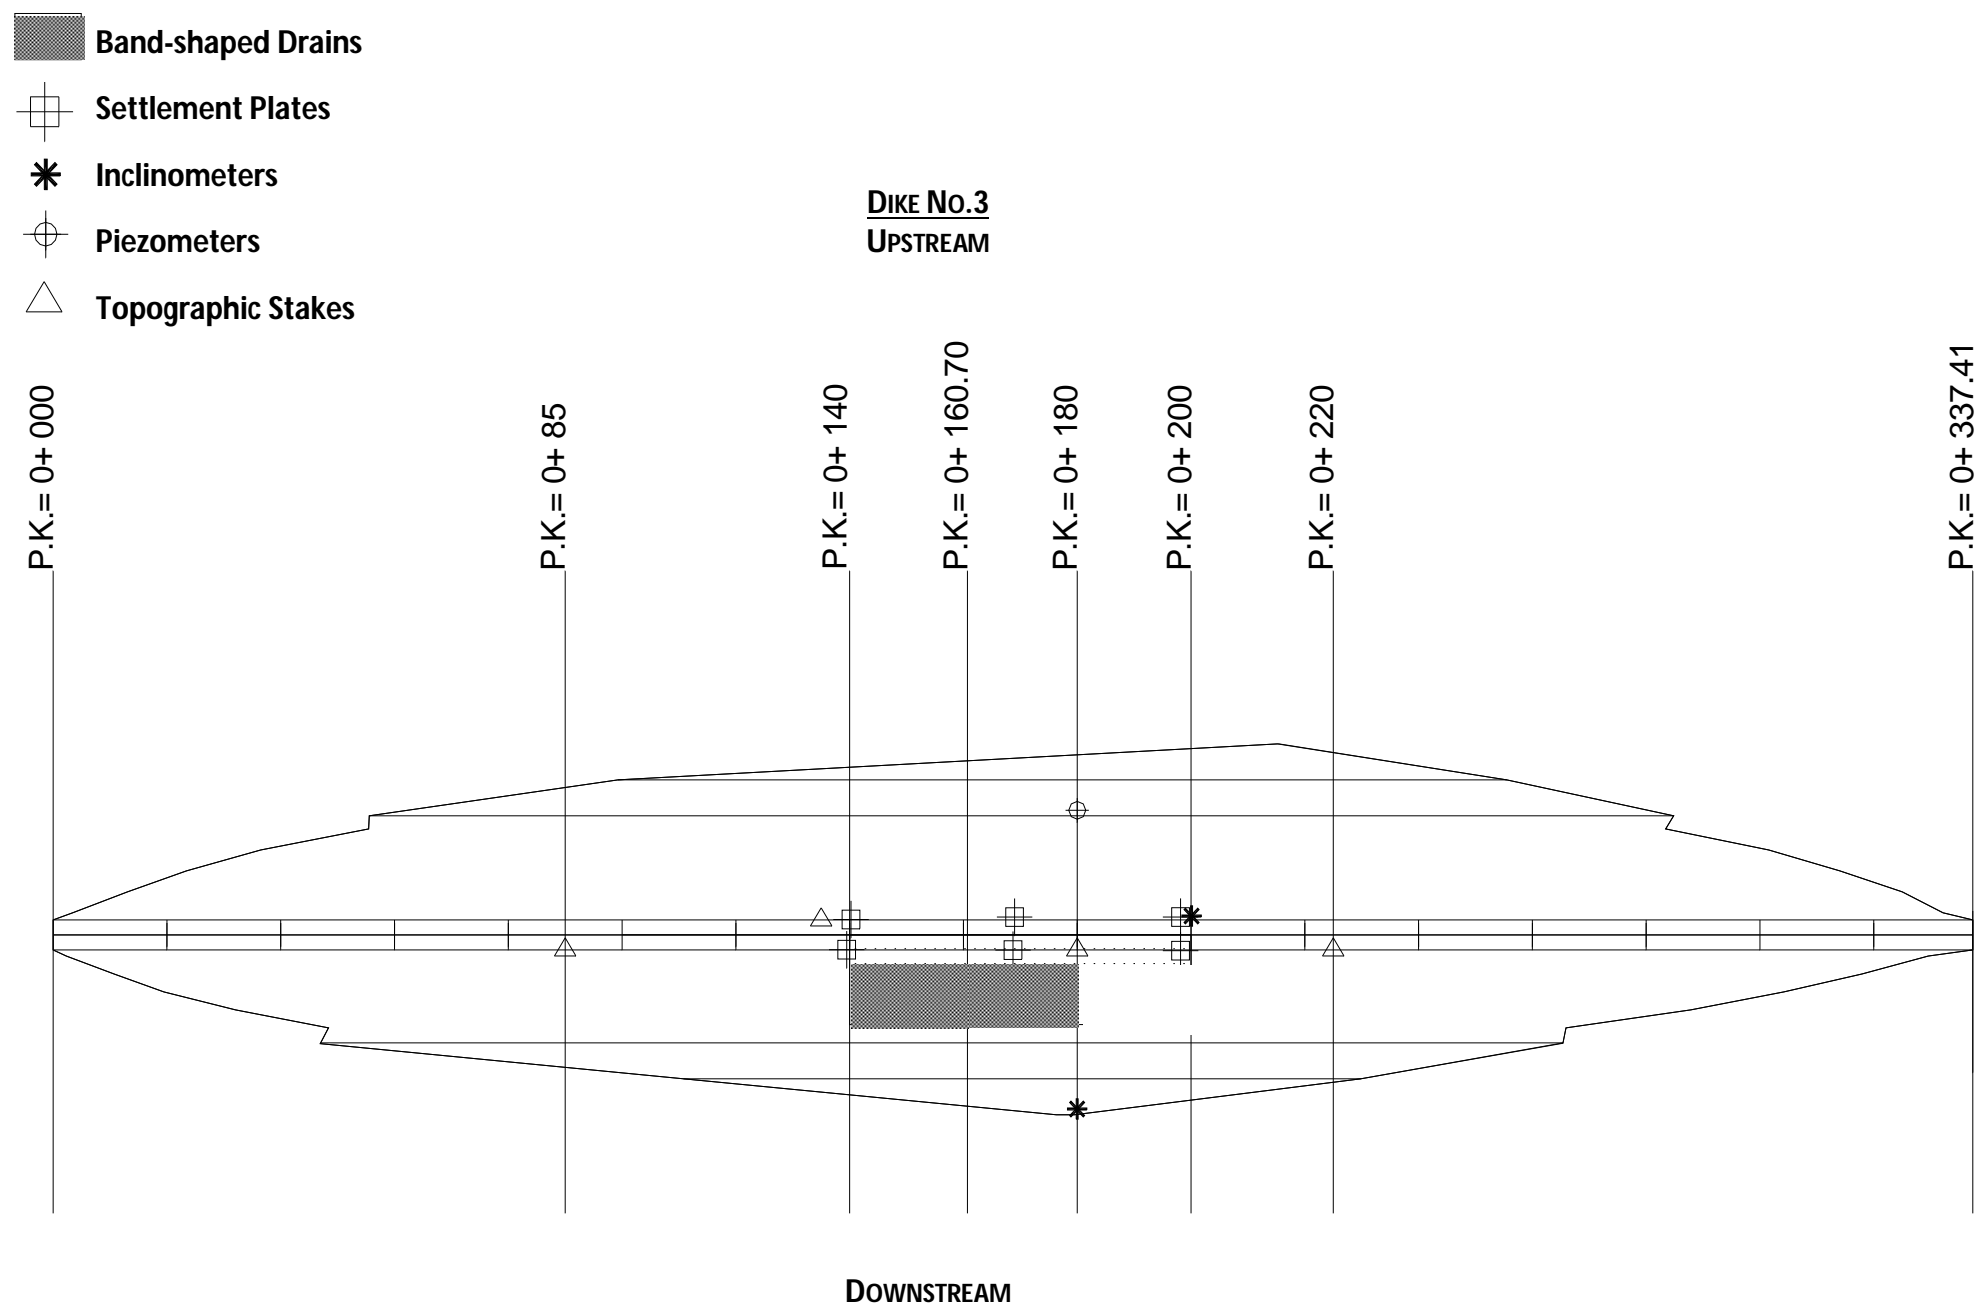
Plan showing all the instrumentation in Dike No.3.
